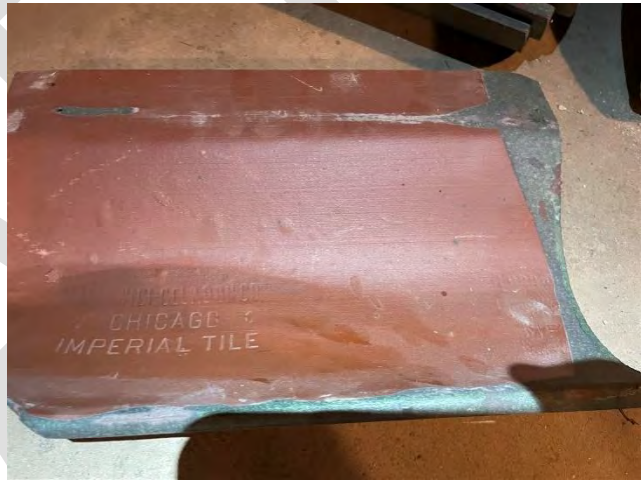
View of terra cotta tile backside labeled "Chicago Imperial Tile." The tiles were manufactured by the Ludowici Roof Tile company.
